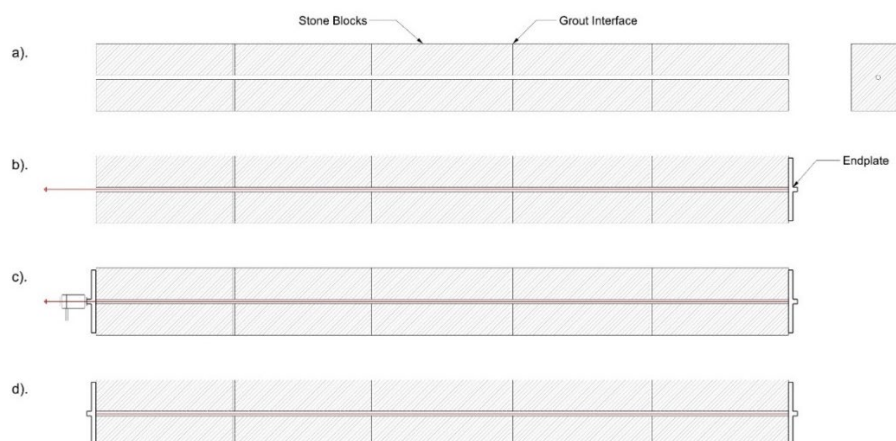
Post-Tensioned Stone Construction Procedure. a) Stone blocks with grout interface and hole bored for cable. b) Cable threaded through hole and affixed to endplate. c) Cable tensioned with jack and plate connection. d) Completed beam, cable tension equilibrated by compression in the stone. [Authors Own]
